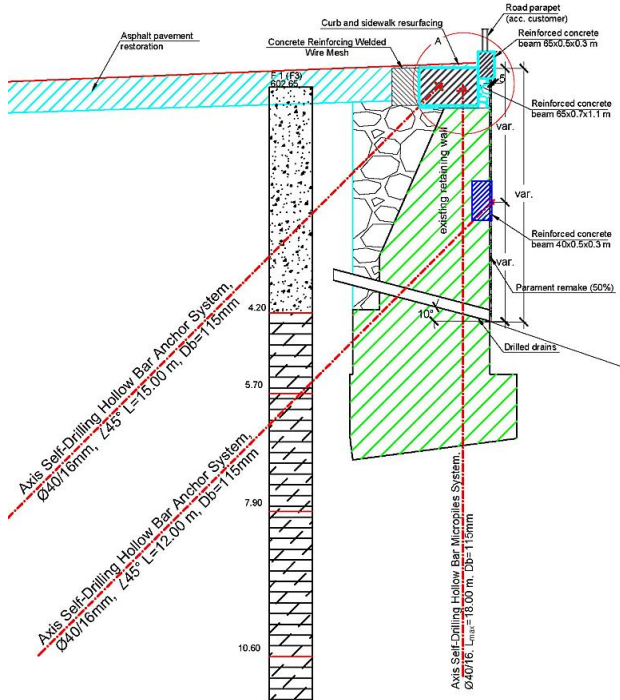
Characteristic section - designed solution for consolidation of the retaining wall.
